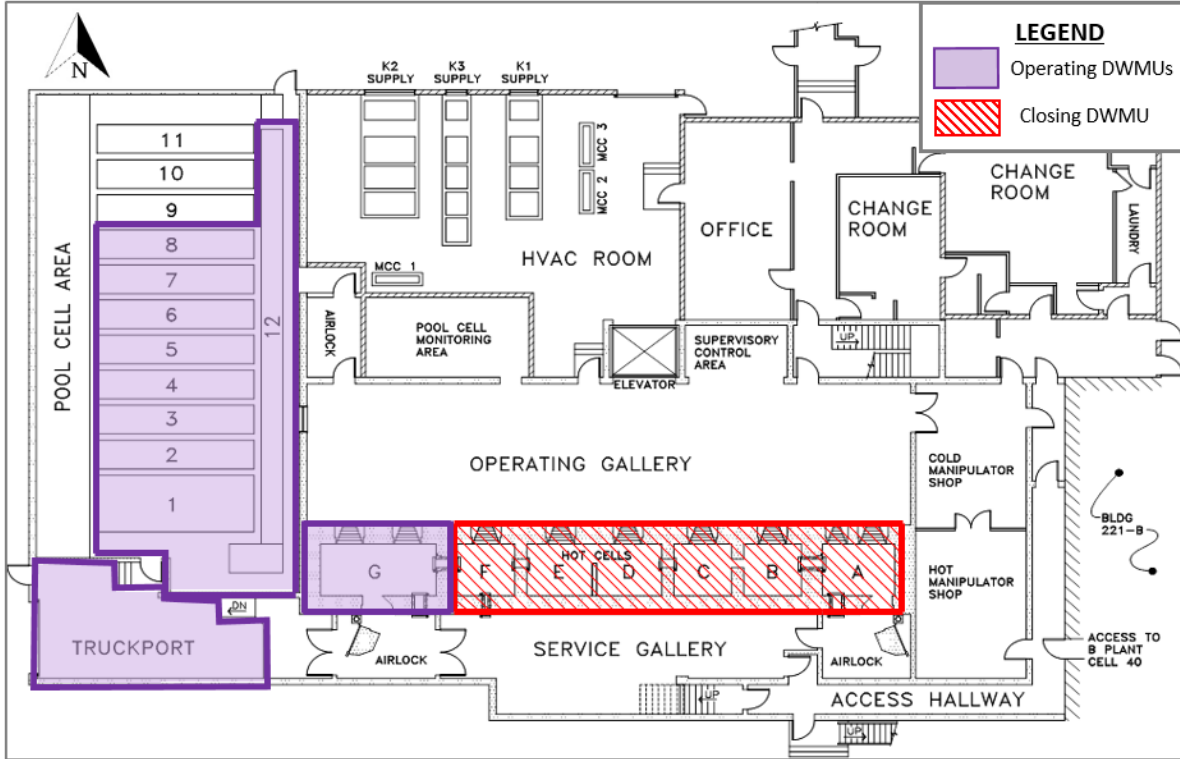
Waste Encapsulation and Storage Facility 225-B Building Detailed First Floor Plan
